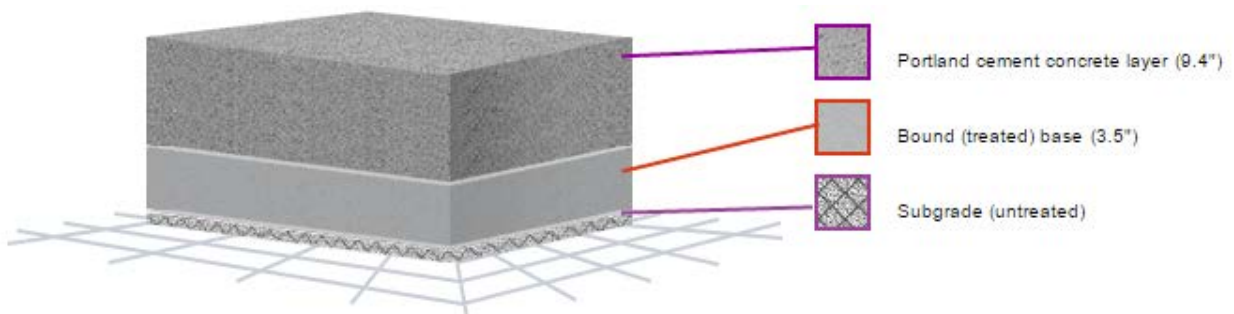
Pavement structure of LTPP Segment 40-5021
